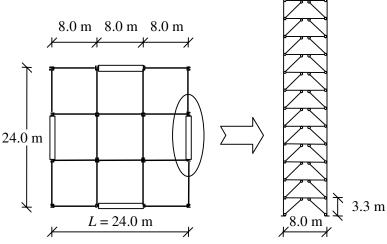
Plan layout and geometrical scheme of the eccentrically braced frames.
